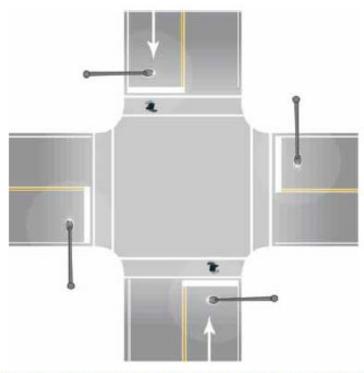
Drawing. New design for intersection lighting layout for crosswalks.
